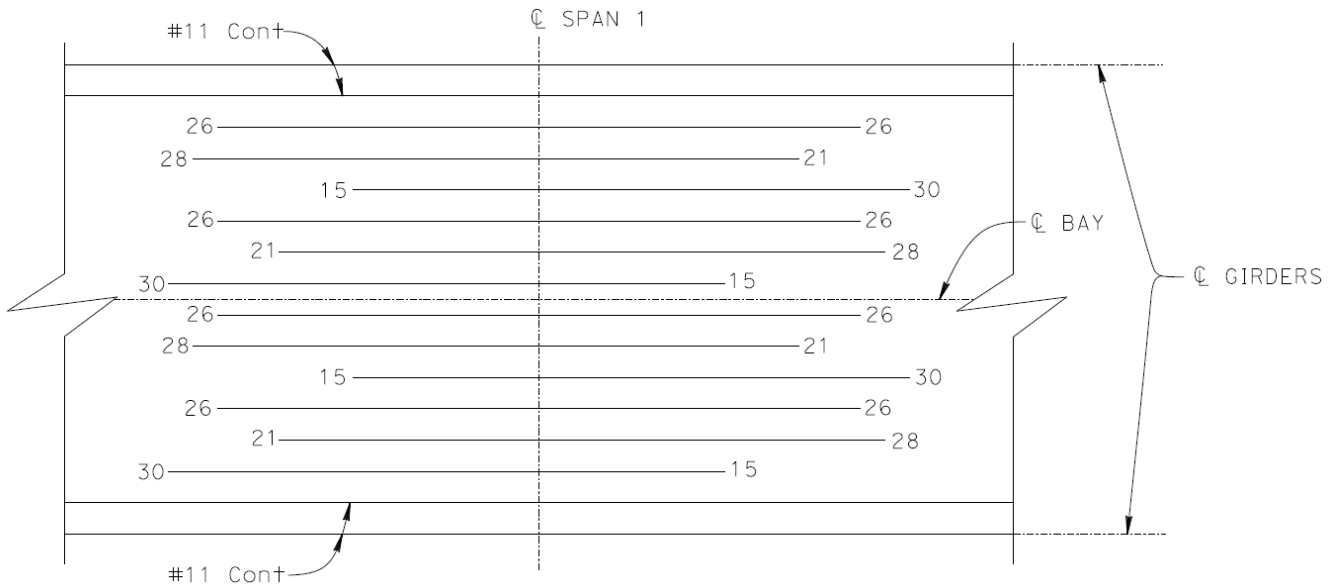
Bottom Slab Reinforcement Layout Example Span 1
